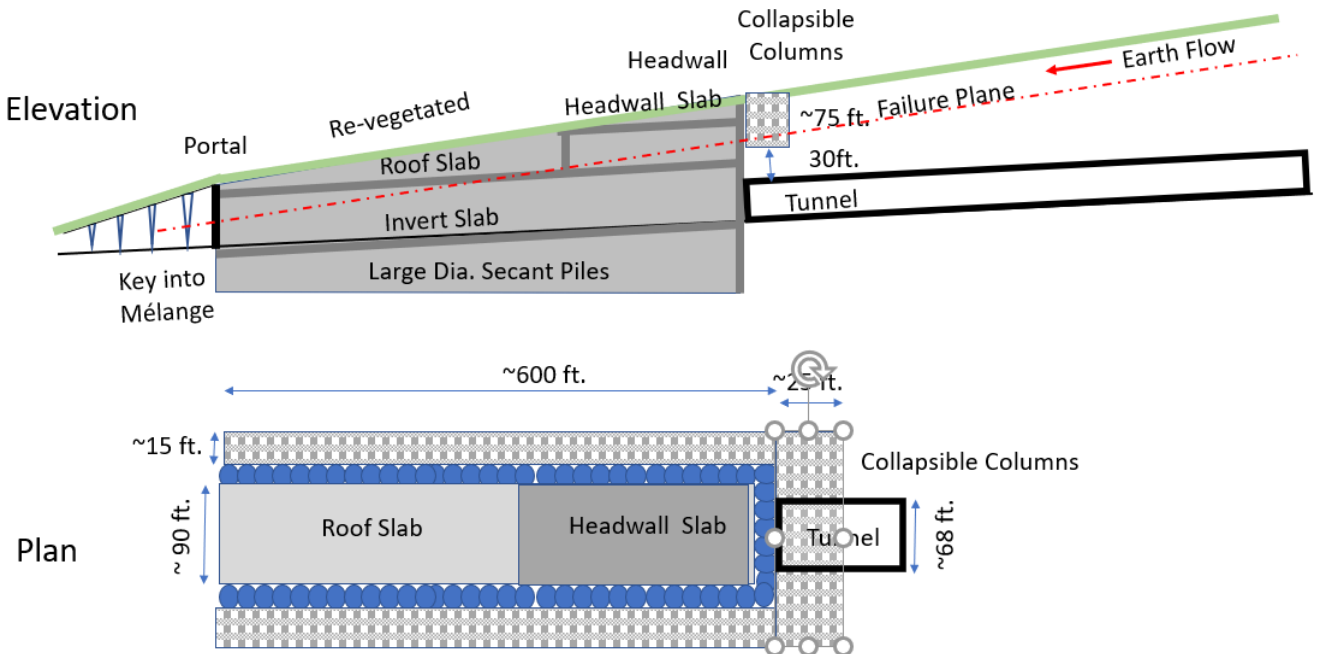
South Portal Approach Structure - Conceptual Configuration
